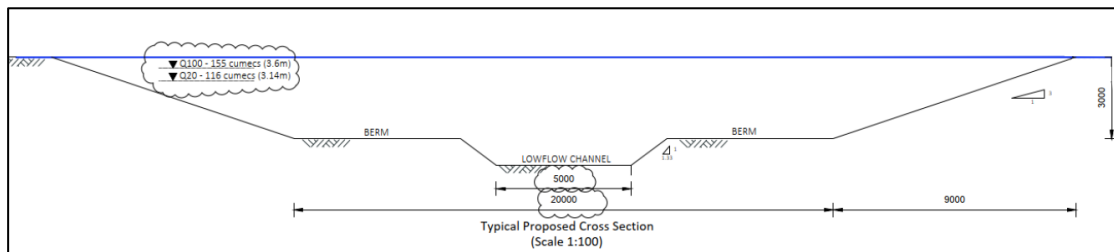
Typical cross section of proposed diversion channel (replicated from D01 appended to Hall report, Attachment [N], p29 of the pdf)
